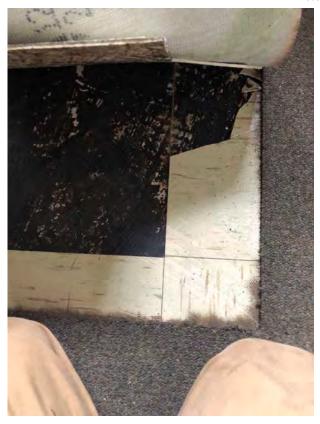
ACM Positive EA-13, Off-white Floor Tile with Tan Streaks.
